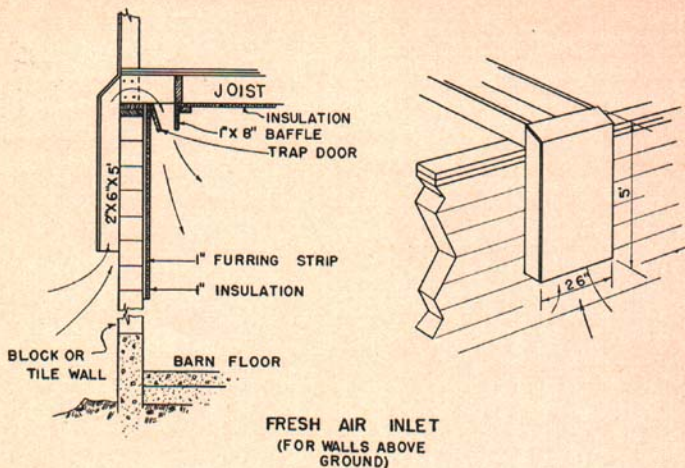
Construction of a fresh air inlet from a barn with masonry walls above the ground.
